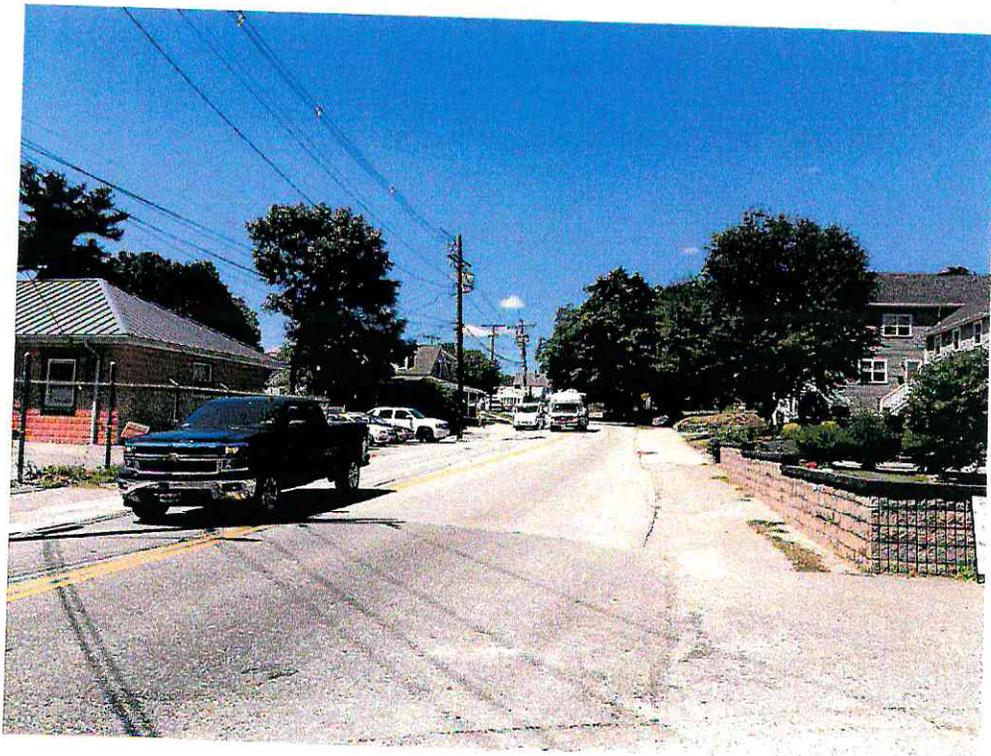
Location o – Cross St. looking west. 20' west of MBTA Bridge.
